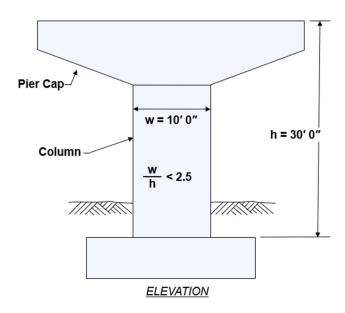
B—Elevation View for Hammerhead Pier with Single Column Example
